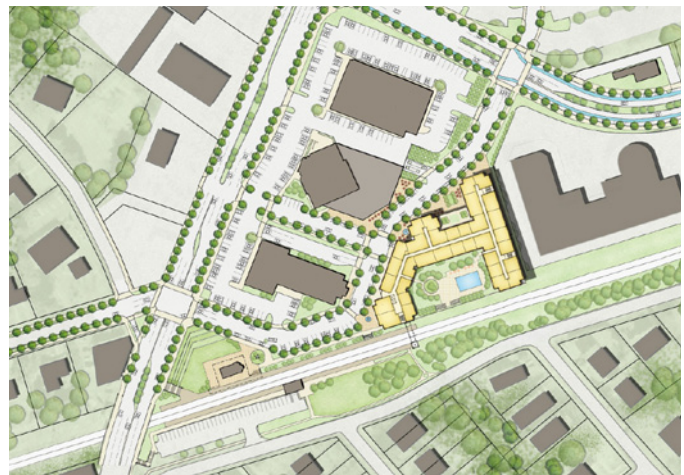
Concept 1 - 7-Story Typical Level Plan
